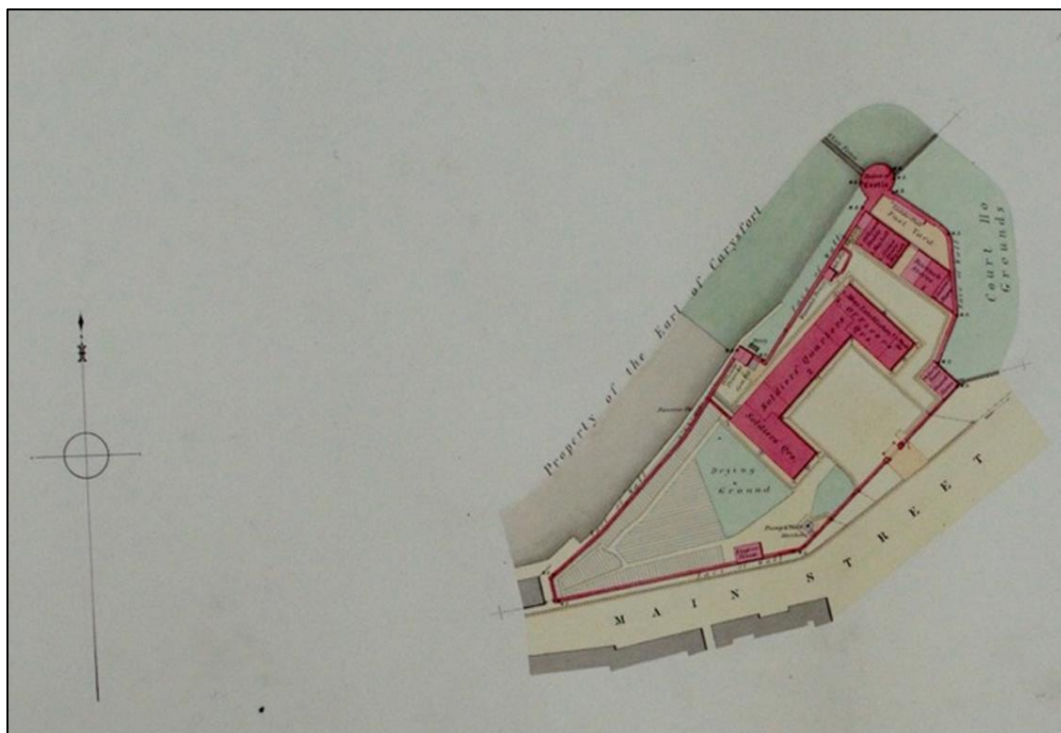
Plan of the barracks 1869/1870 (National Archives, London, WO 78/4387).
